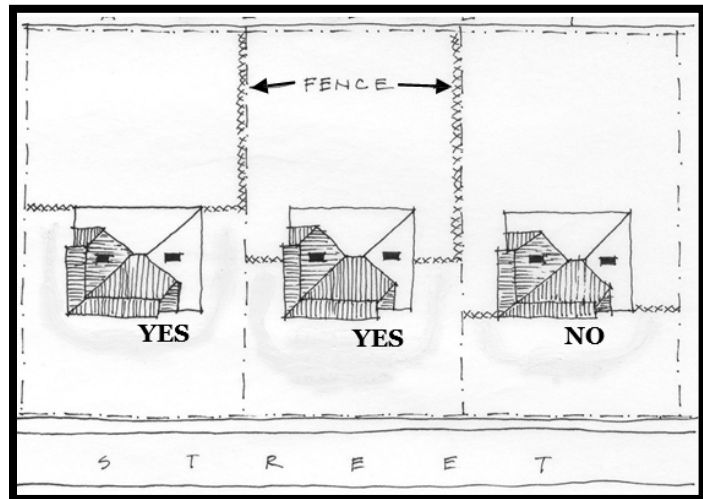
FENCES AND WALLS MUST BE SET BACK FROM THE FRONT FAÇADE OF THE PRIMARY BUILDING.
